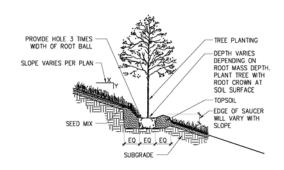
SLOPE-AFFECTED PLANTING DETAIL
